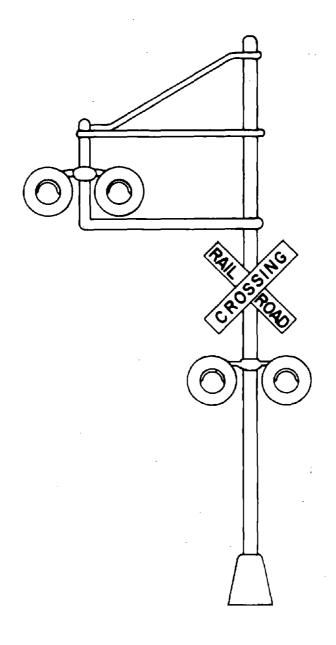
CANTILEVER FLASHING LIGHT INSTALLATION
